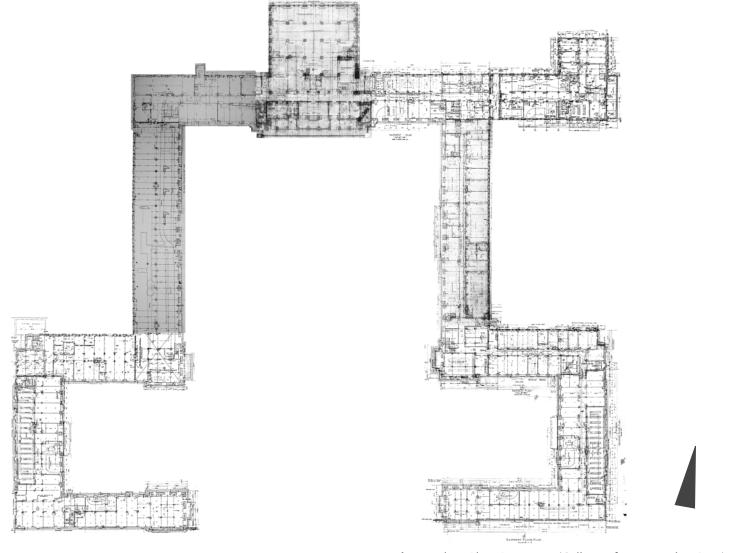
Floor Plan- Basement (Collage of separate drawings).
